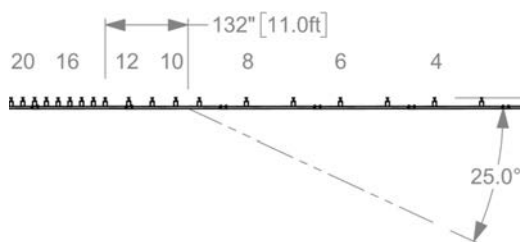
Plan view of MASH Test 3-21 with a longer quarter- to full-post spacing transition (7).
